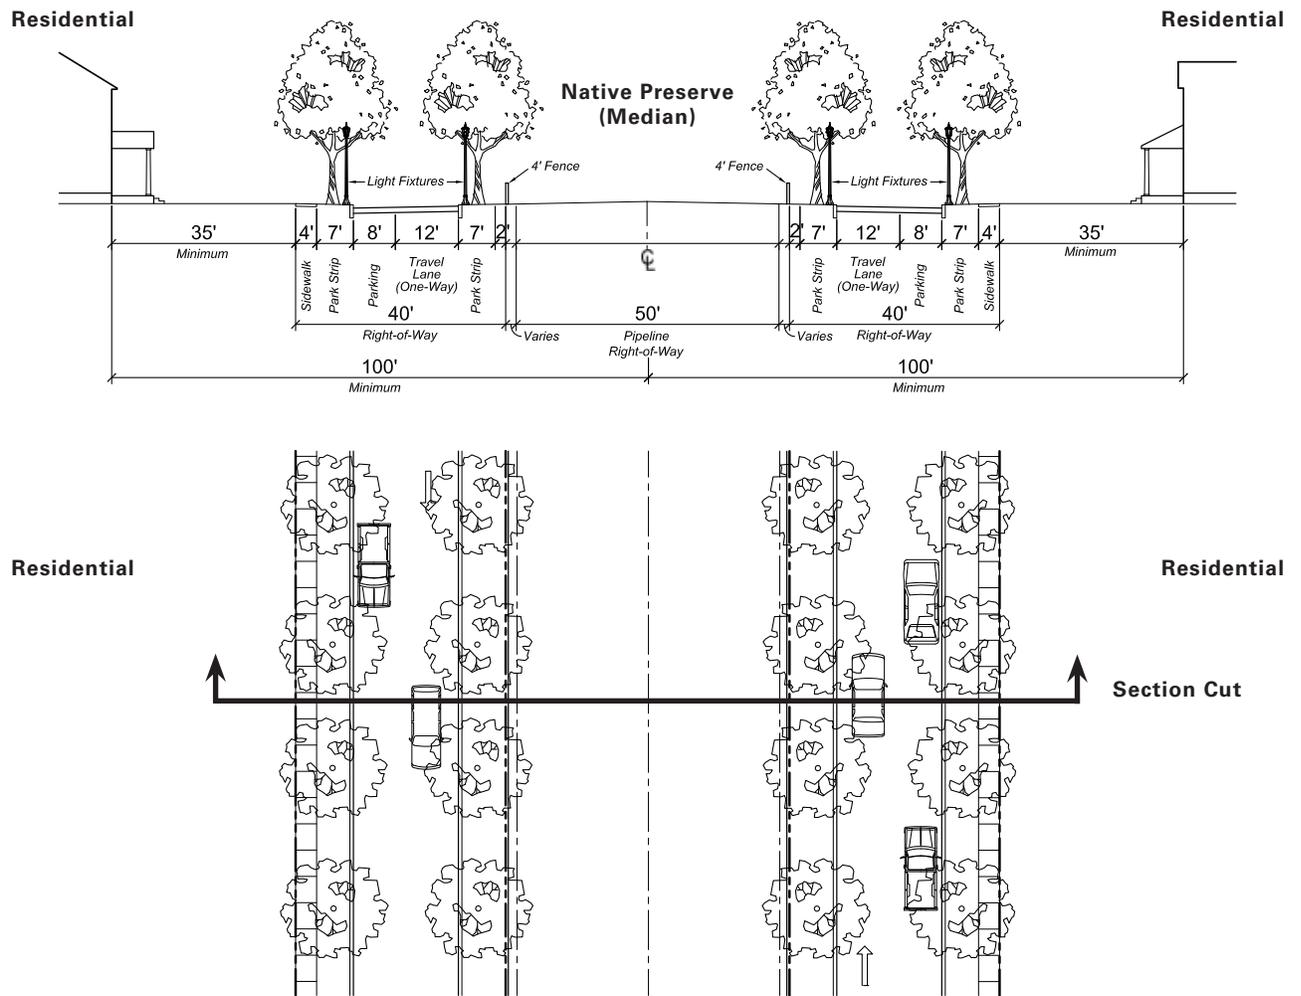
Proposed Section and Plan: Neighborhood Street E
